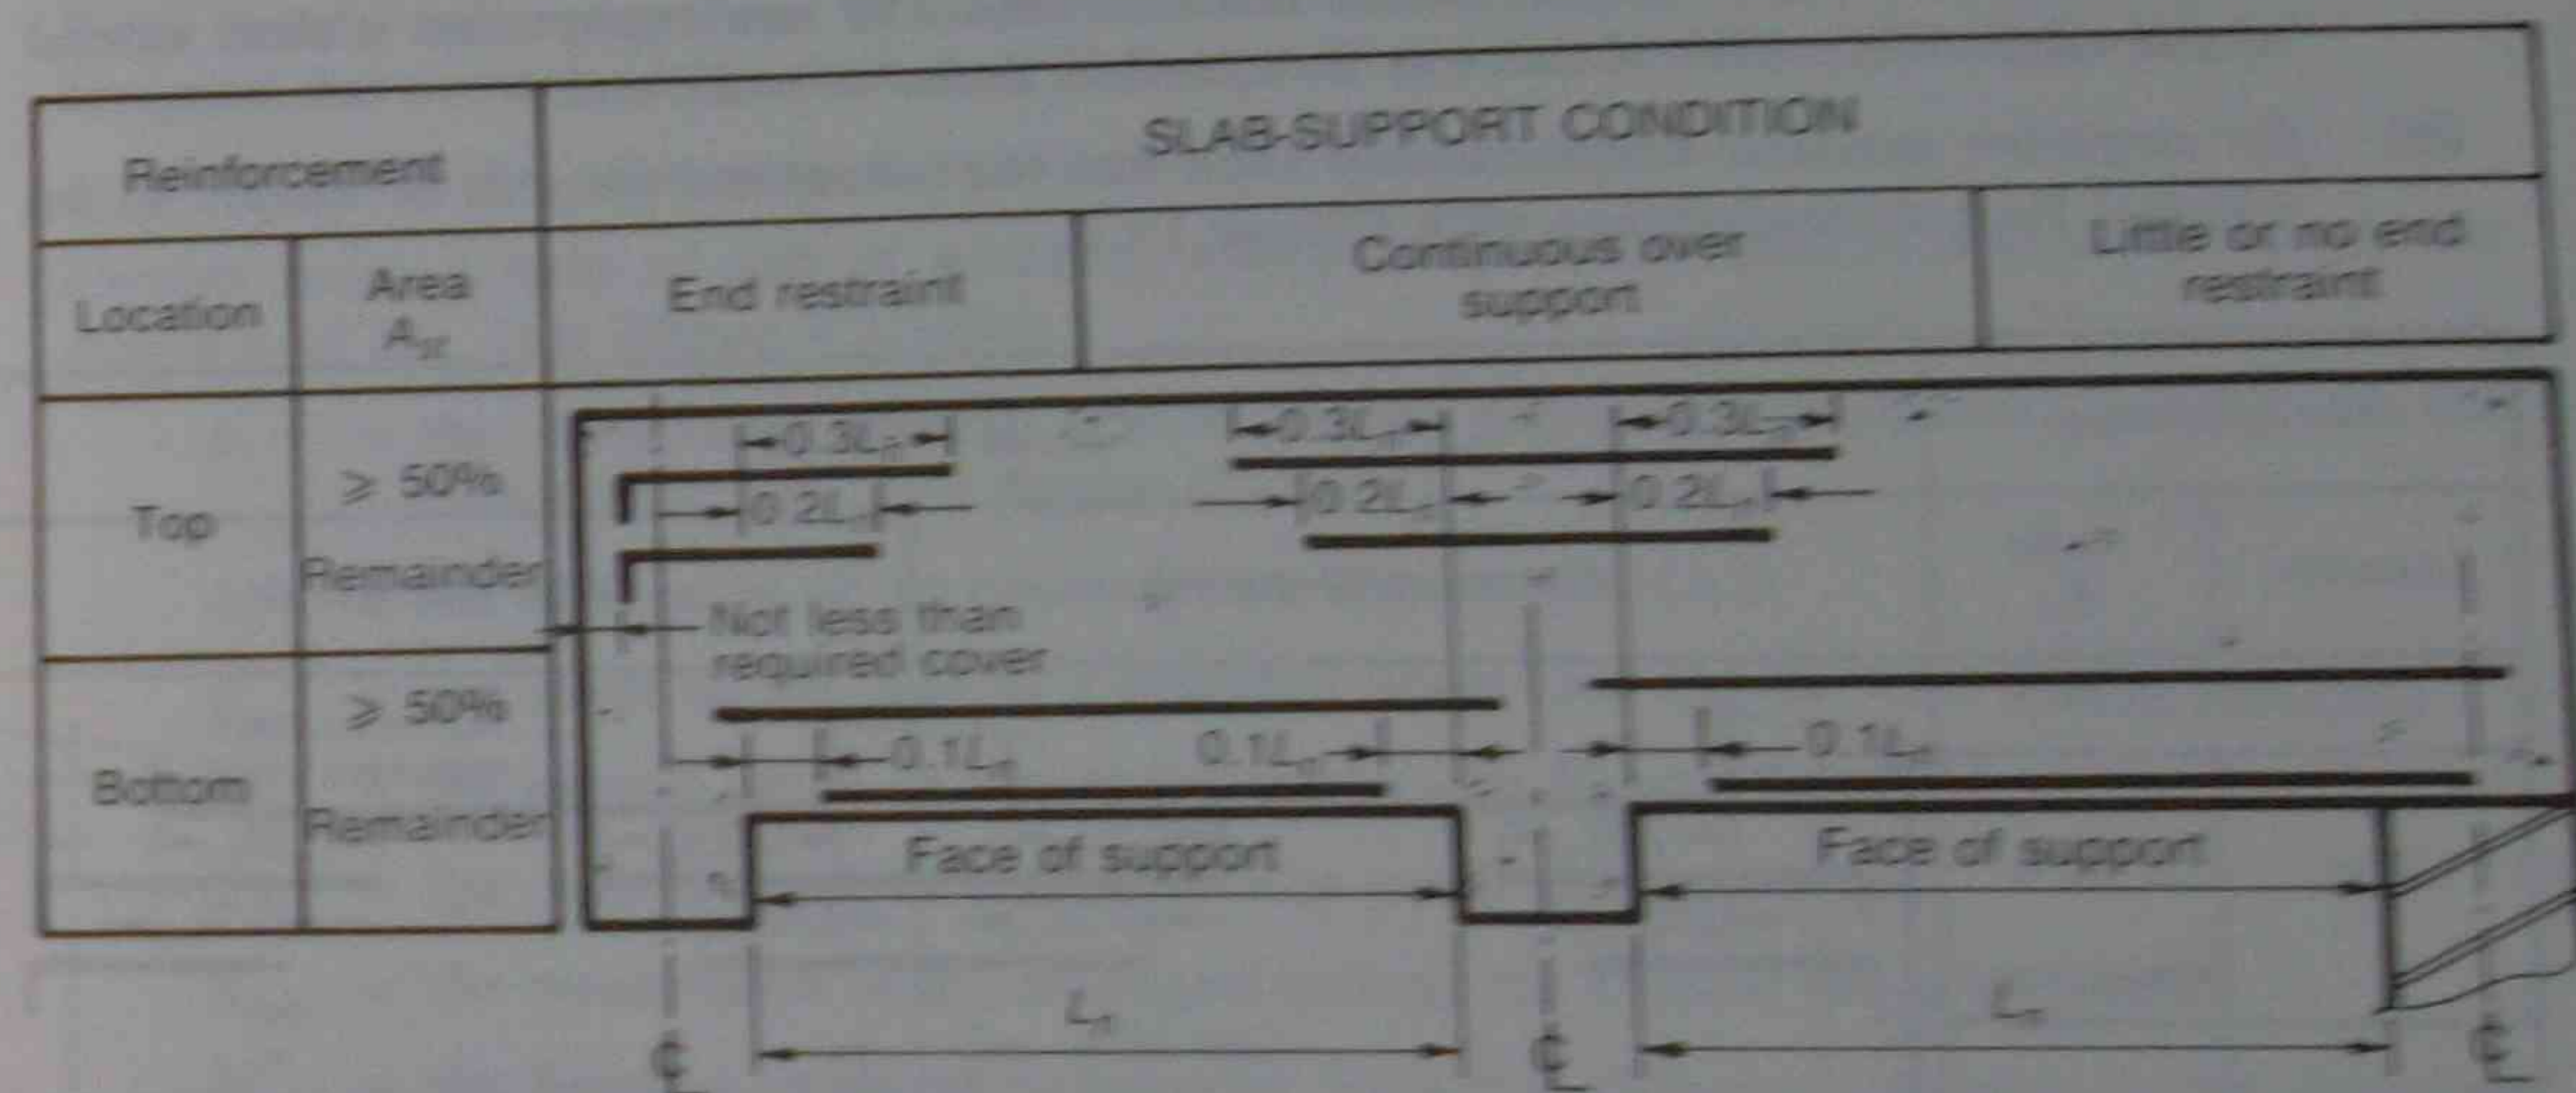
ARRANGEMENT OF REINFORCEMENT
